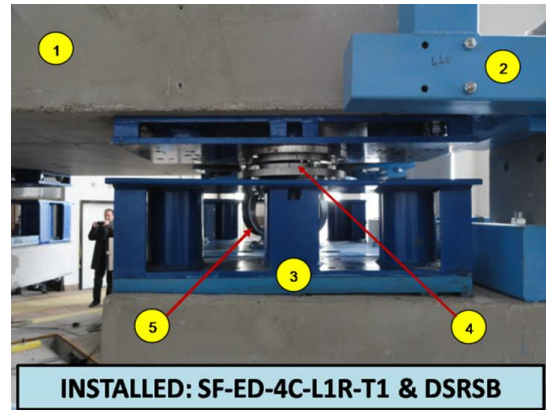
Installed SF-ED device type-2 (SF-ED-4C-L1R-T1): (1) superstructure; (2) steel support of DL-device; (3) steel support of DSSSB device; (4) DSSSB device; (5) SF-ED component
